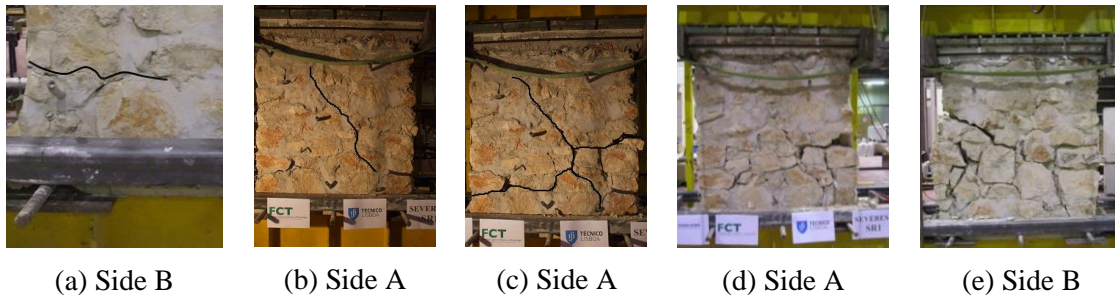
Specimen SR1. First visible crack (a-c); Collapse mechanism (d and e)
